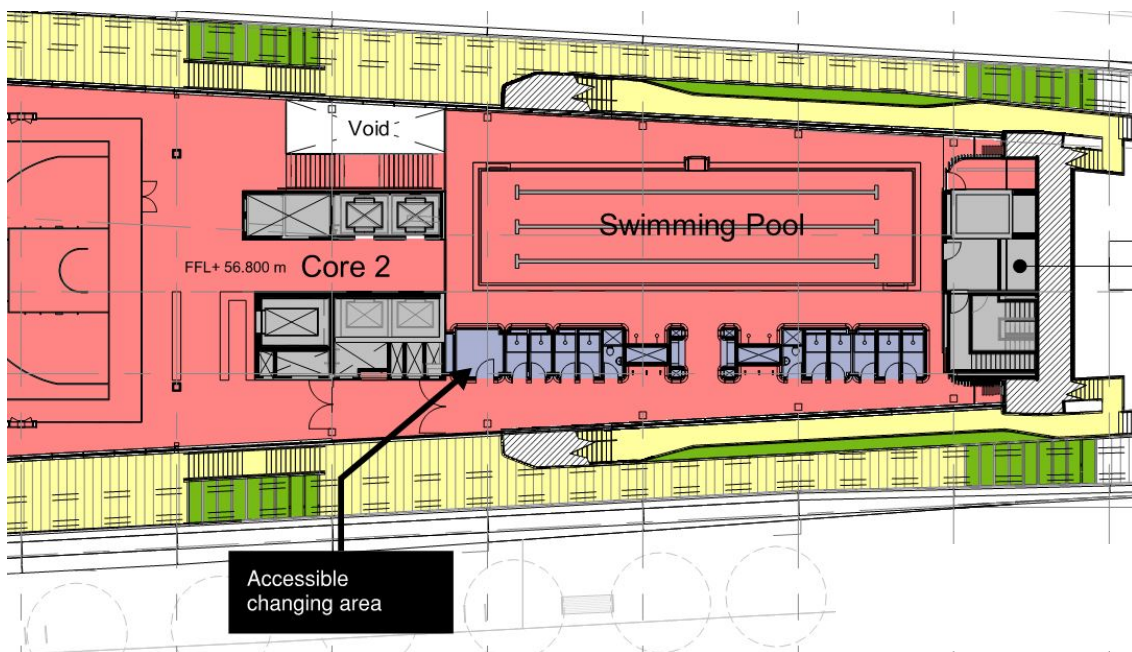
Level 9 Plan Showing the Swimming Pool and Accessible Changing Area
